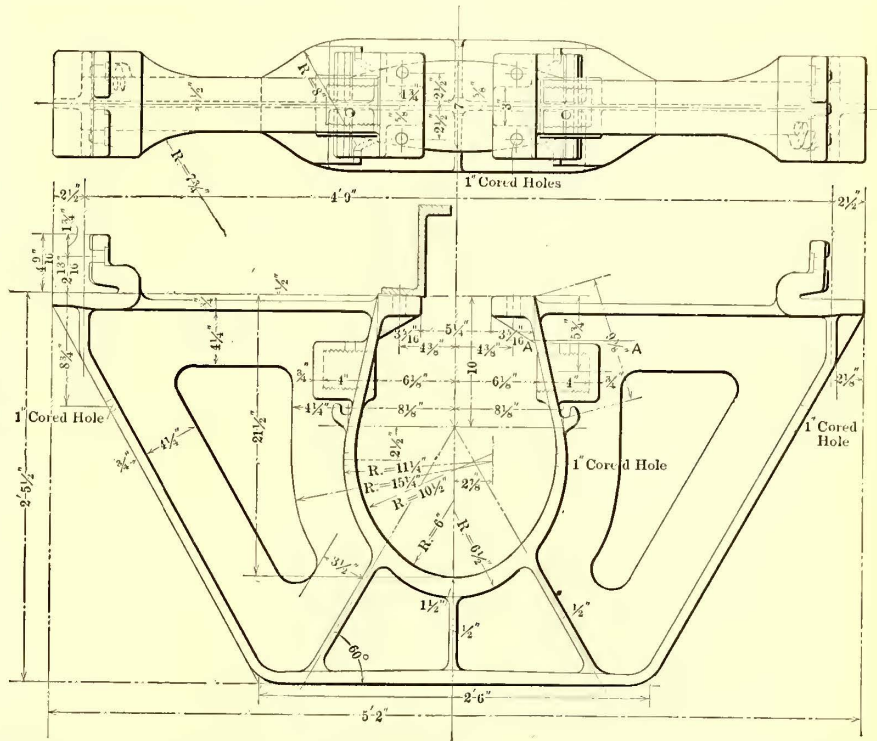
ELEVATION AND SECTION OF STANDARD YOKE FOR ELECTRIC OR CABLE CONDUIT CONSTRUCTION—METROPOLITAN TRACTION CO.
